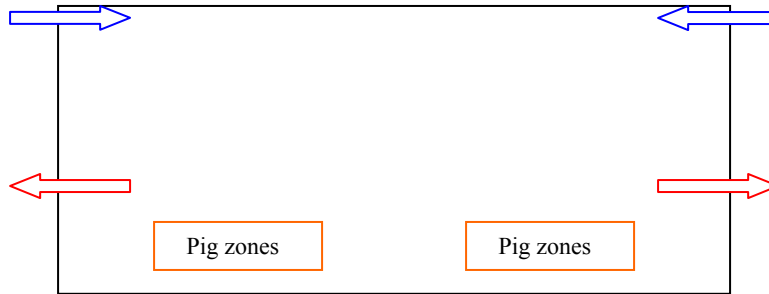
Arrangement of inlets and outlets for layout 2
